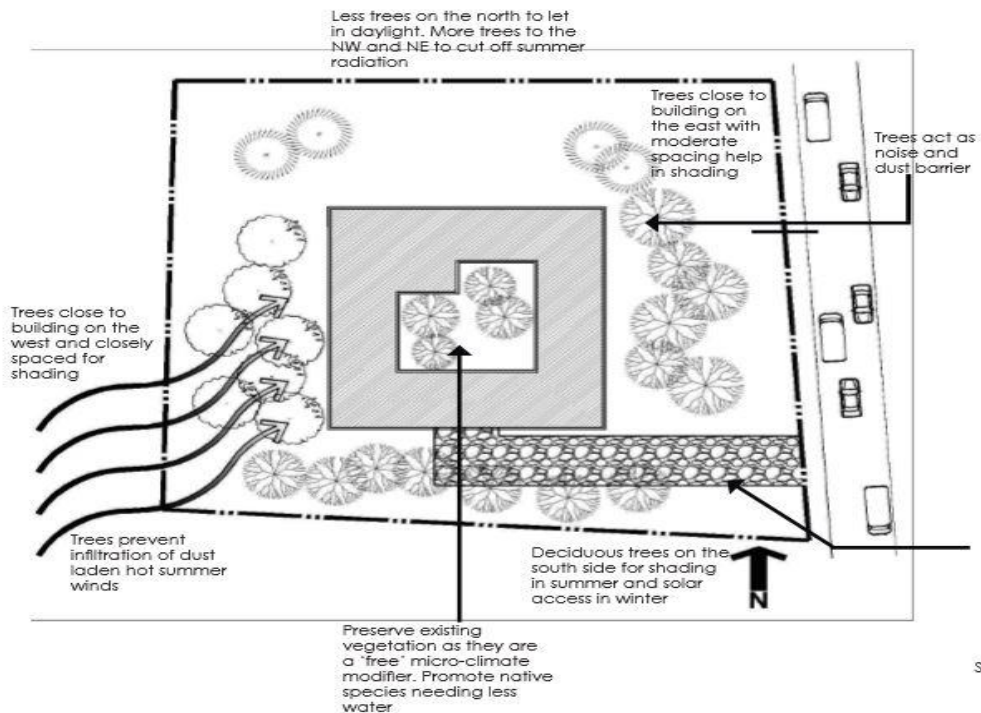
Planting Plantation (Source: Central Public Works Department, 2013)
